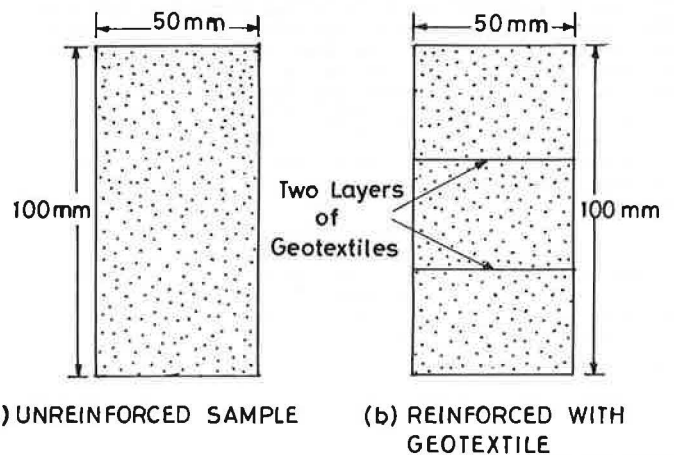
ARRANGEMENT OF GEOTEXTILES
